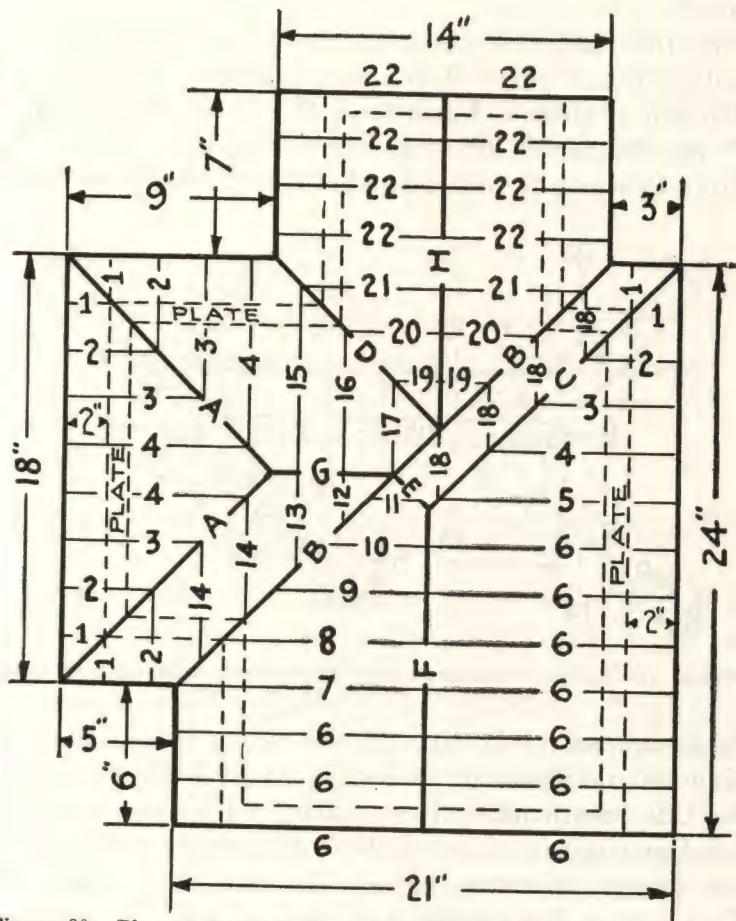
Plan of Problem No. 1, from Which the Working Layout Is Made
